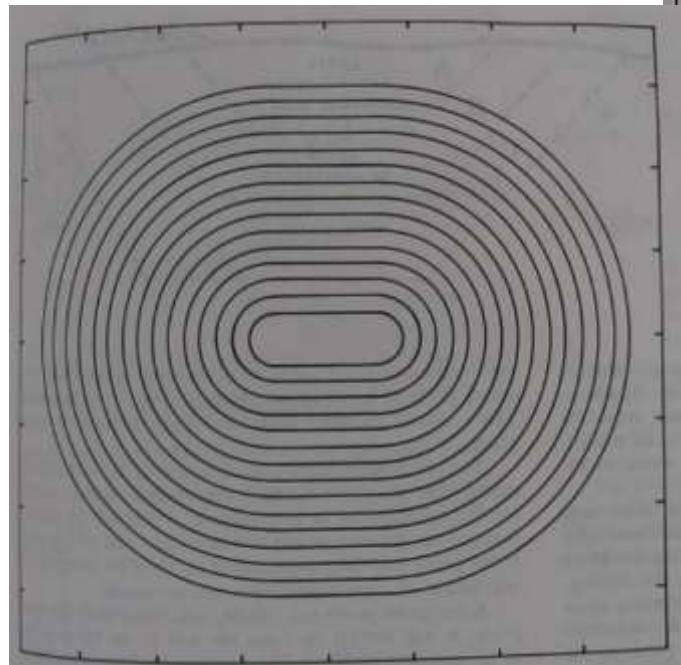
Pit designed with a 38° overall slope to allow for a 45° inter-ramp slope and a road system
